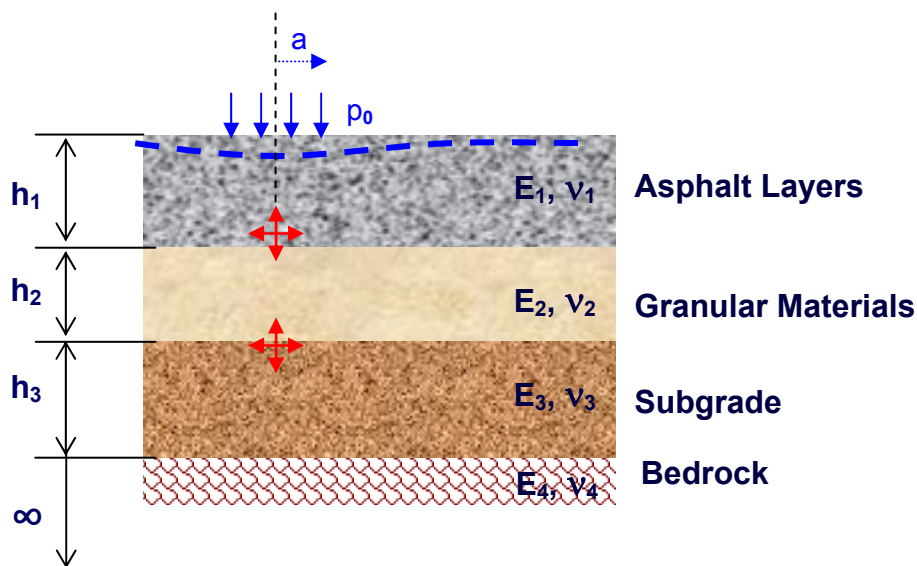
Pavement response model for flexible pavement structure (stresses, strains and deflections)
